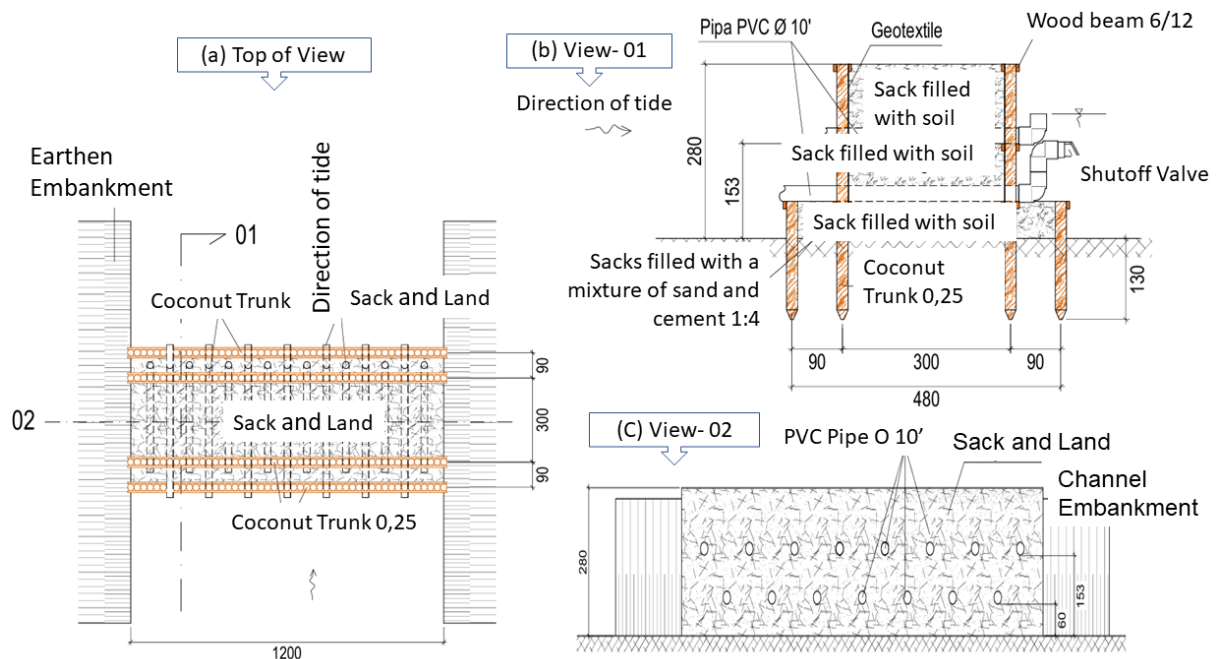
Canal blocking plan: (a) Top view of canal blocking position;(b) Front view-01, construction of blocking canal;(c) Front view-02, PVC pipe placement
